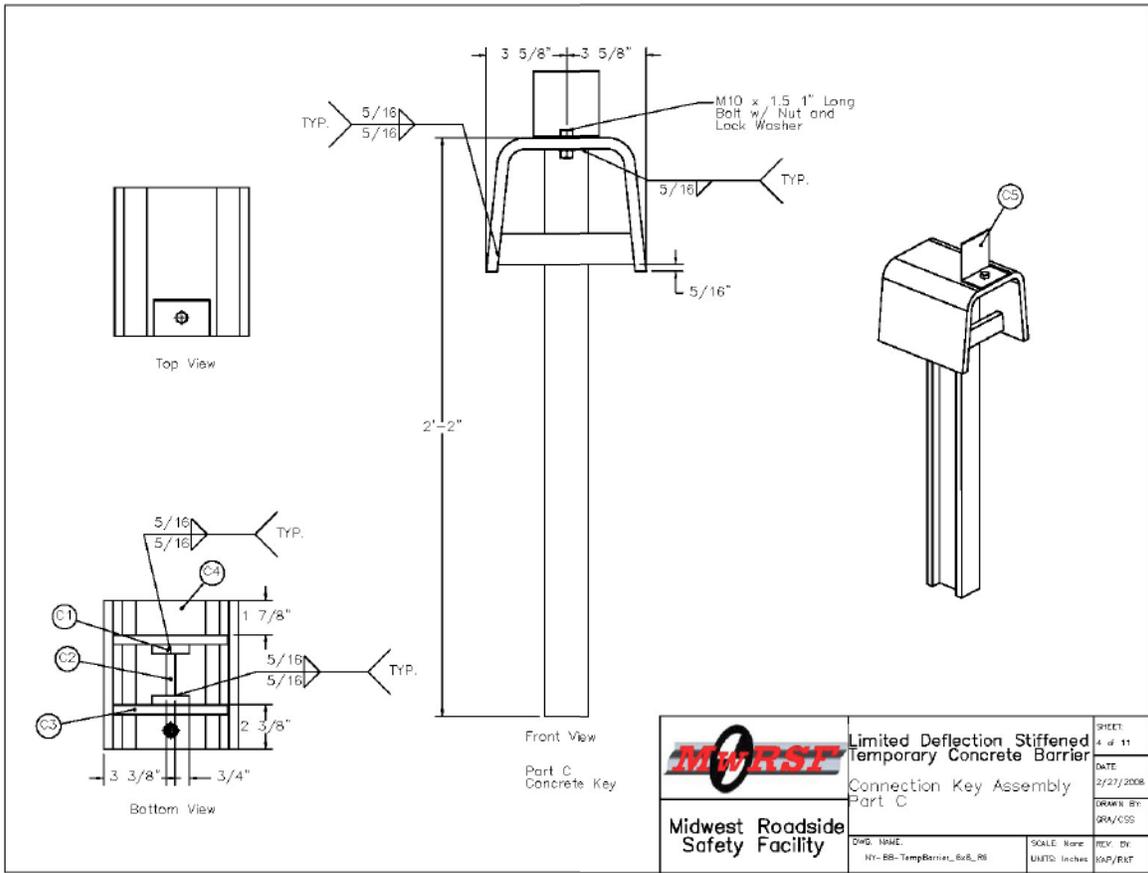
Temporary Concrete Barrier Connection Details (English), Test NYTCB-3
